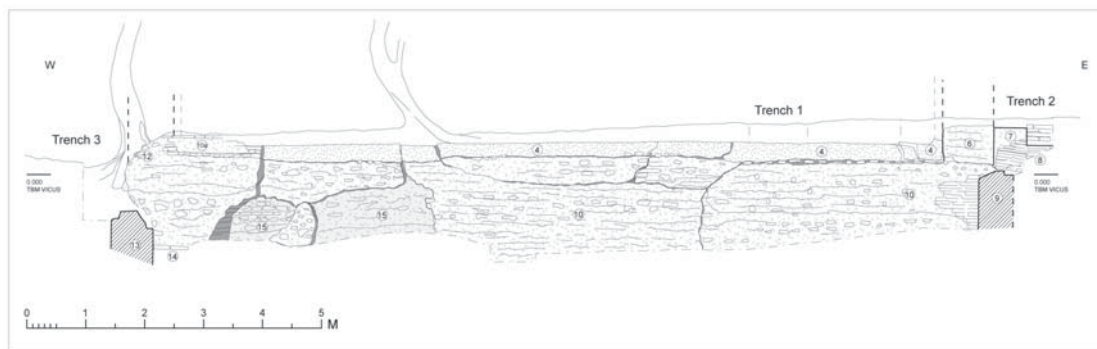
'Sea Wall' at Tor Paterno. Seaward elevation.
